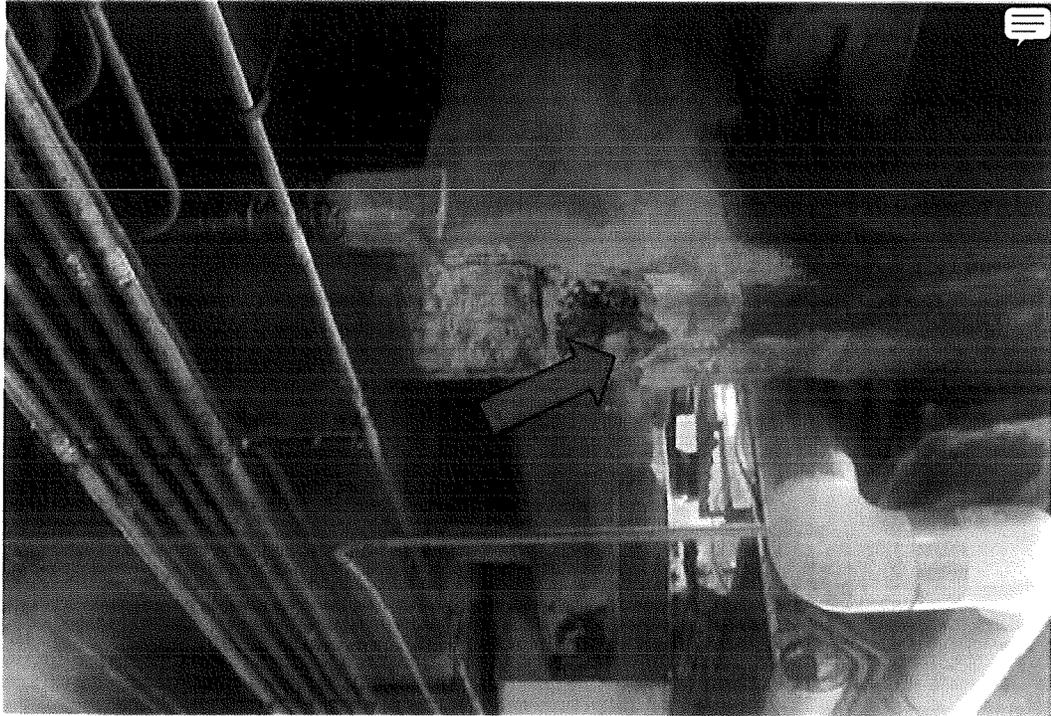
Cracked and hollow sounding encasement at the underside of the Sixth Floor over the entrance to Car Parking Level 5 at Column Line 3/U1. (Approx. 5 SF)
